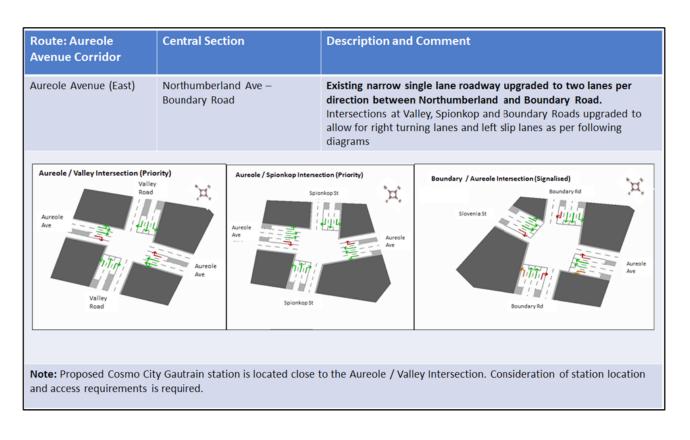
Cross-Section Upgrade Descriptions of Aureole Avenue between Northumberland Avenue and Boundary Road (Central Section)
